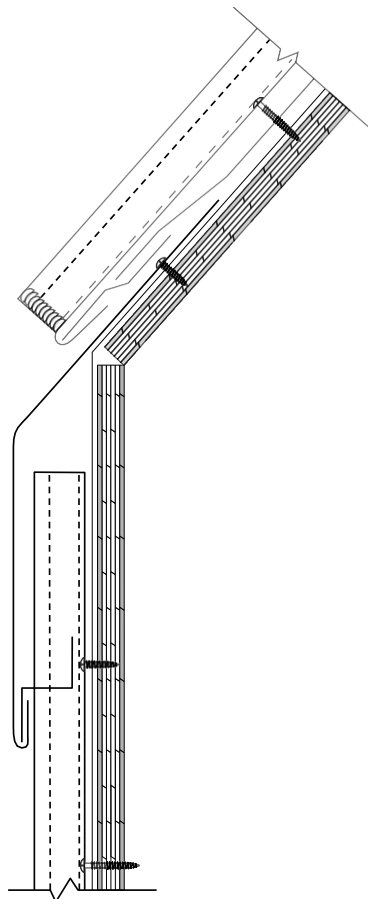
JOINING THE ROOF PANEL WITH THE FAÇADE PANEL
